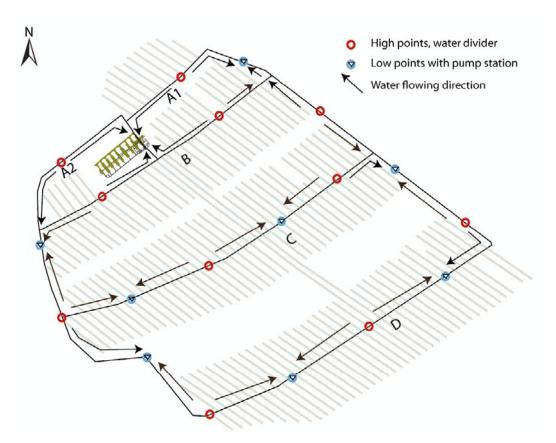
Drainage system, plan at 470 m depth (RHB 70). The water will run from the higher points (water divider) to lower points where it will be pumped on to next section.
